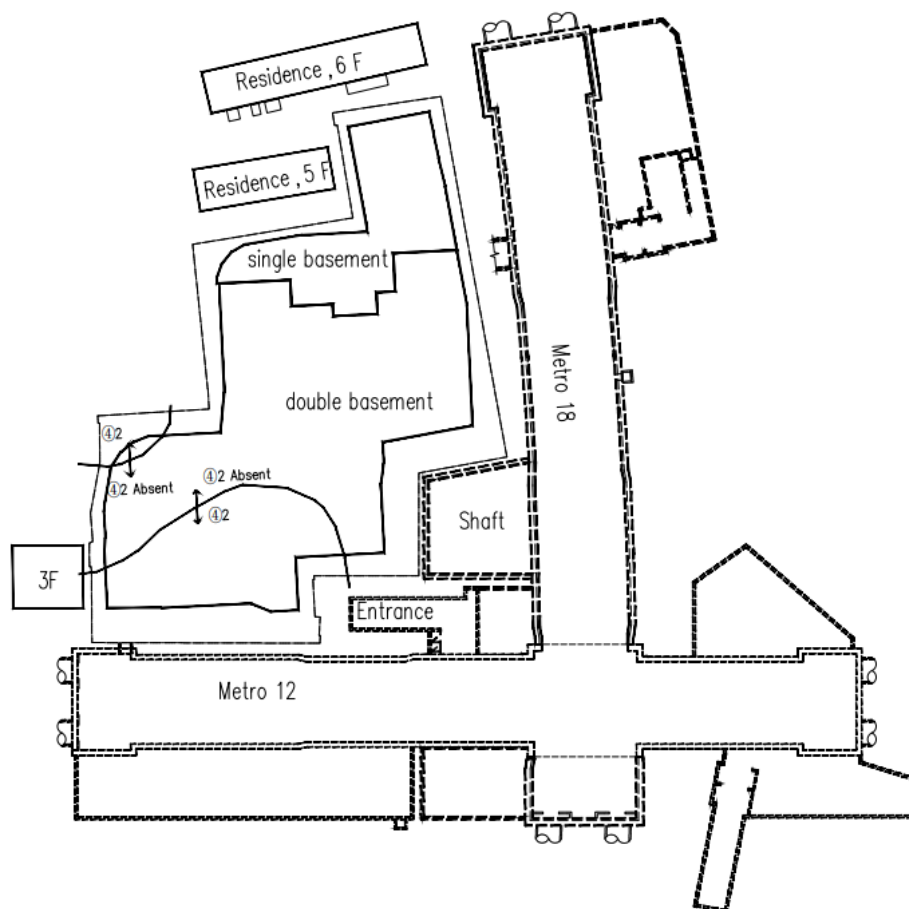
Schematic diagram of the foundation pit surrounding environment.
